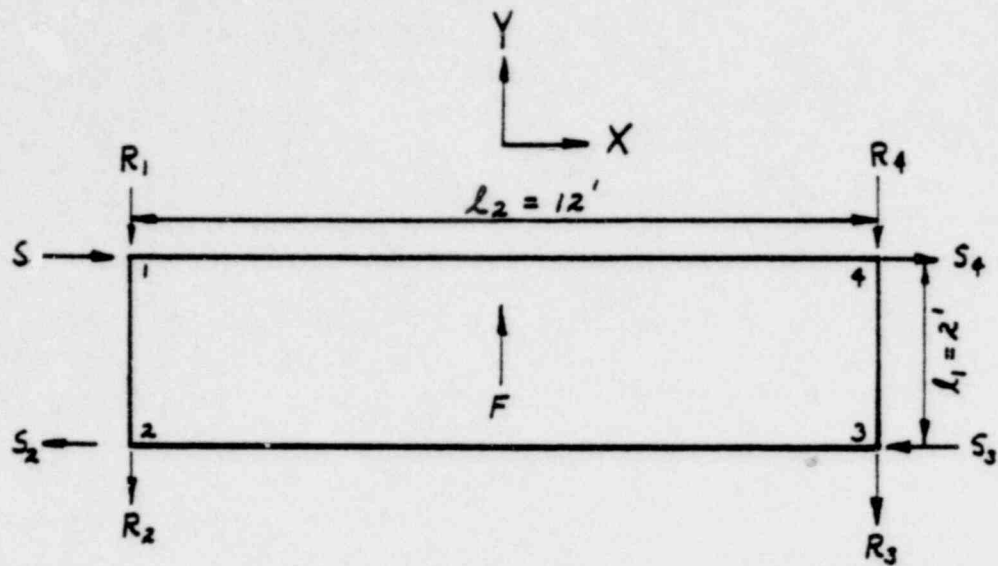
ASSUMED FORCE DISTRIBUTION ON ROOF CHANNEL SLABS
